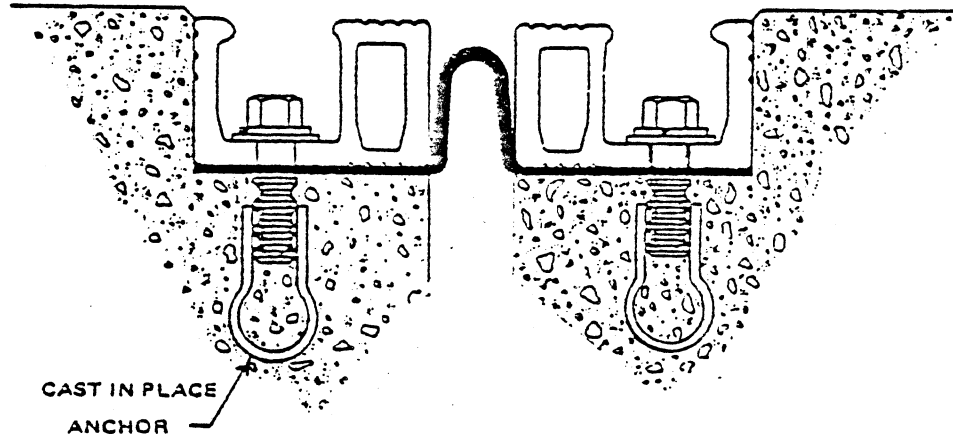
Typical section of the ON-FLEX 45 bridge deck expansion joint showing the cast-in-place type anchorage.
